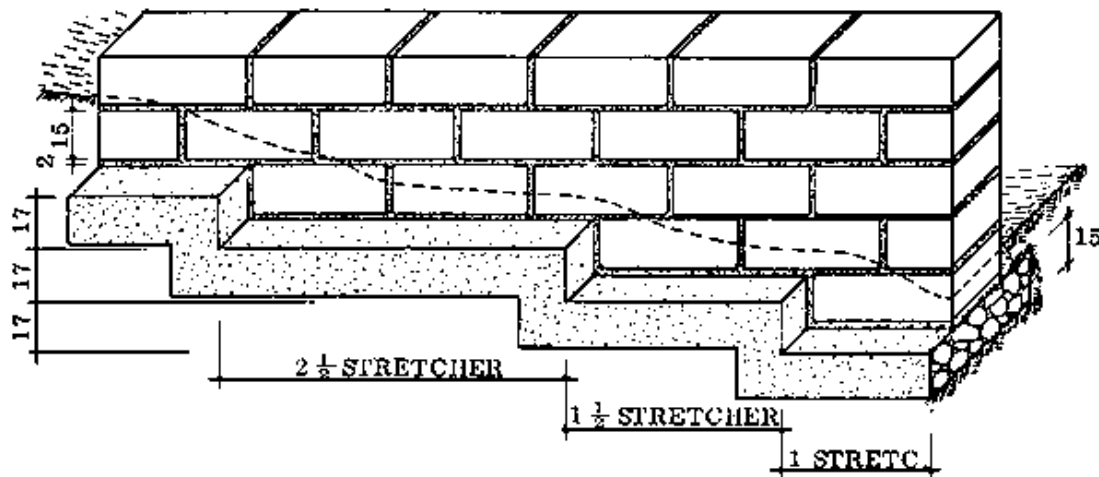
STEPPED FOUNDATION WITH SANDCRETE FOOTING
